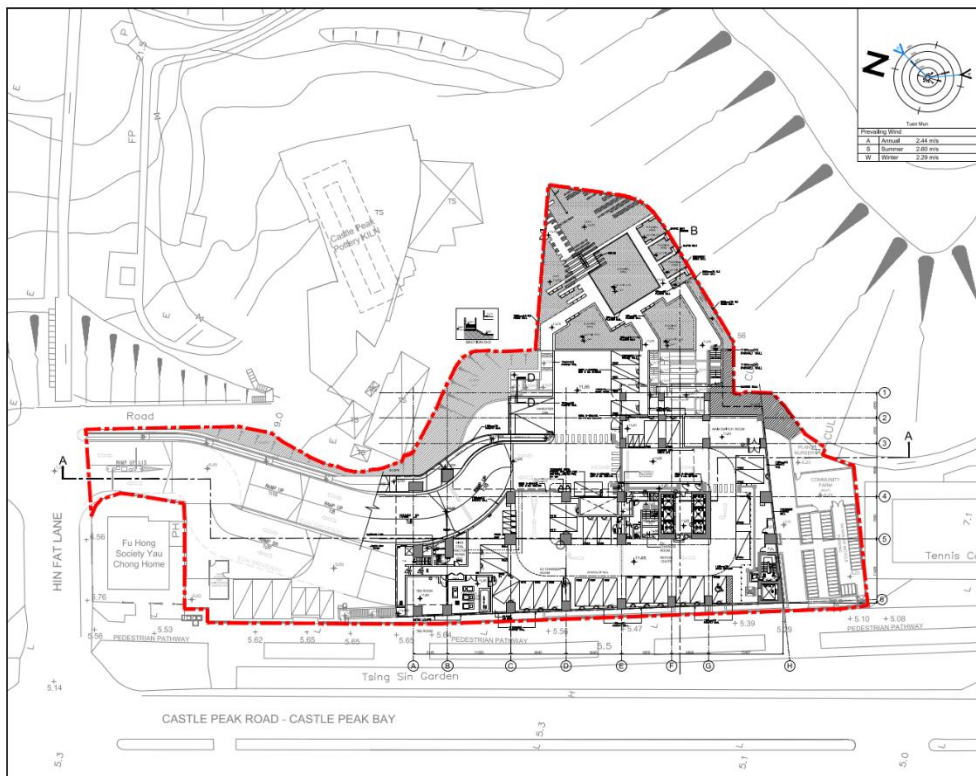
Indicative Plan of Proposed Scheme (Upper Ground Floor)
